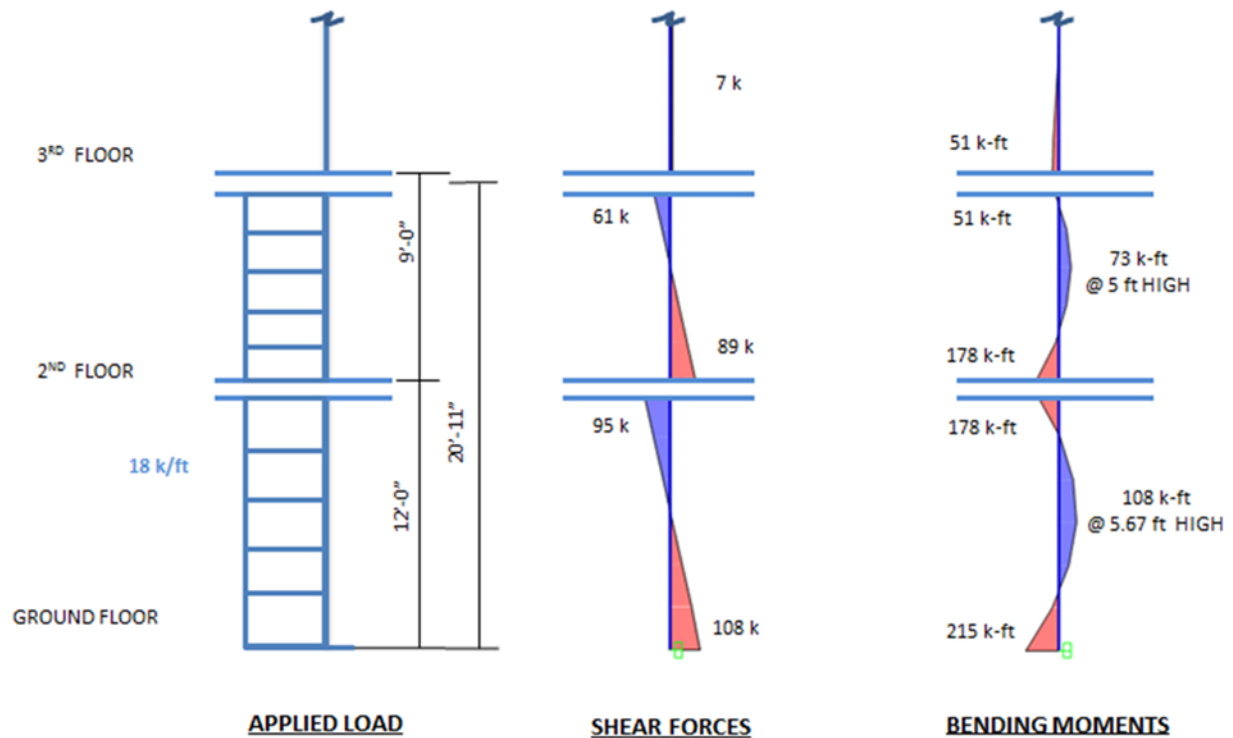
Hydrodynamic loading on 5.67 foot wide section of exterior wall of Seaside residential building due to Load Case 2
